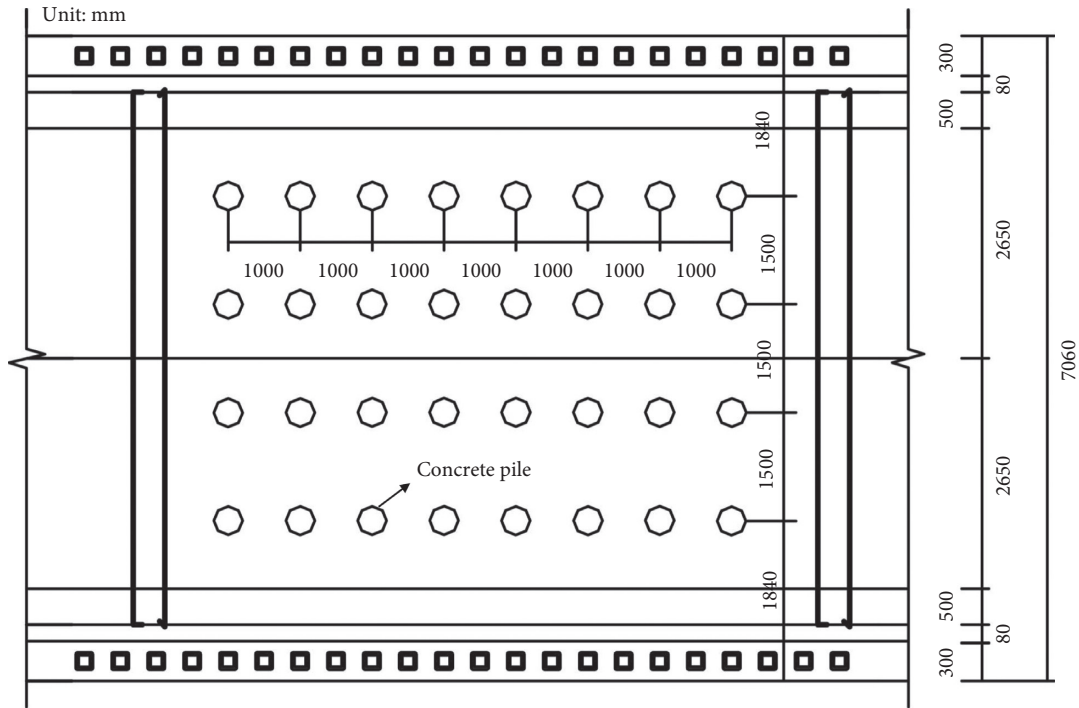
The layout plan of concrete-filled steel tube piles.
